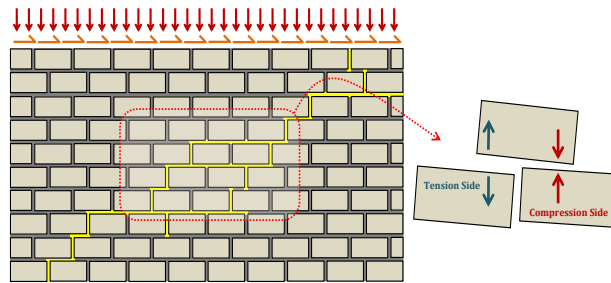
Eccentric loading on hollow concrete blocks in a masonry wall under combined action of shear and compression
